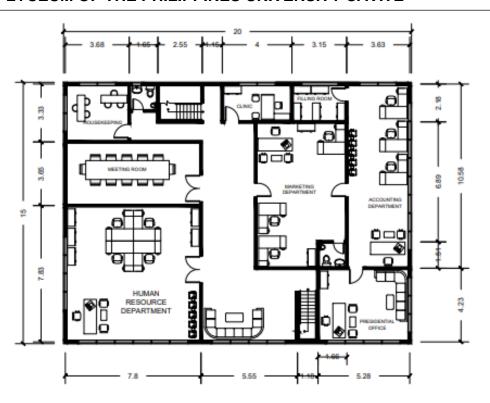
Office, Store and Factory Floor Plan: Second Floor
